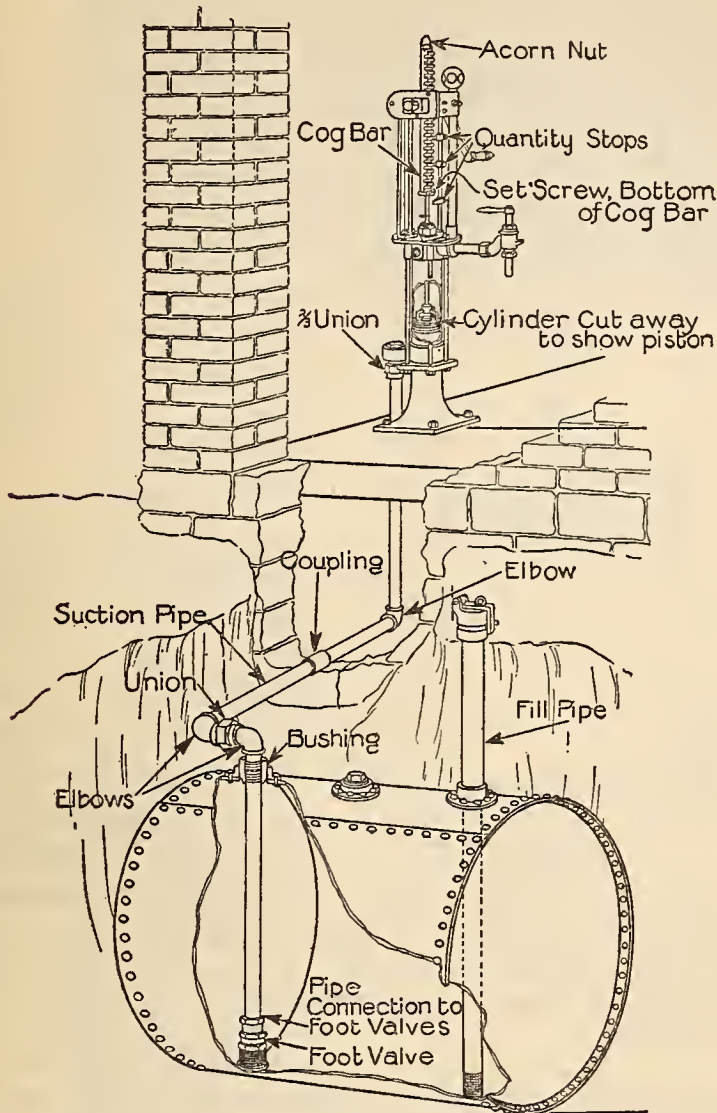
Typical piston-type measuring pump installation, showing arrangement of tank, piping, valves, etc.
